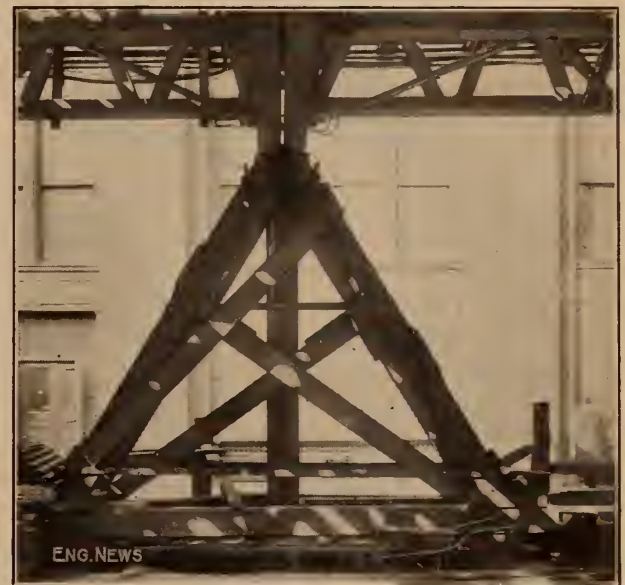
TIMBER A-FRAME WITH EYE-BAR CLAMP SUPPORTING ELEVATED-RAILWAY COLUMNS, CHURCH ST.
